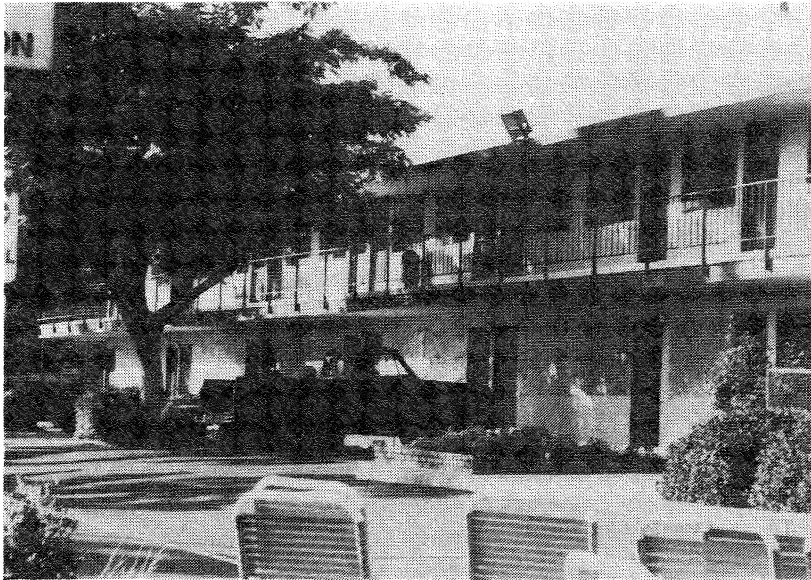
BOARDED-UP MOTEL 6 BUILDING, ARCADIA
